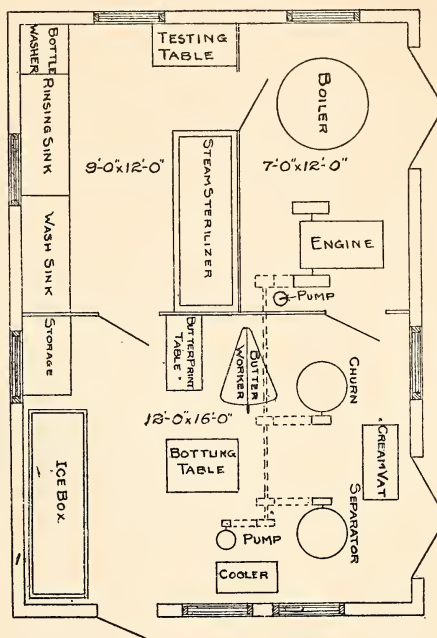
Ground Plan for Dairy House for 20 to 50 Cows.
